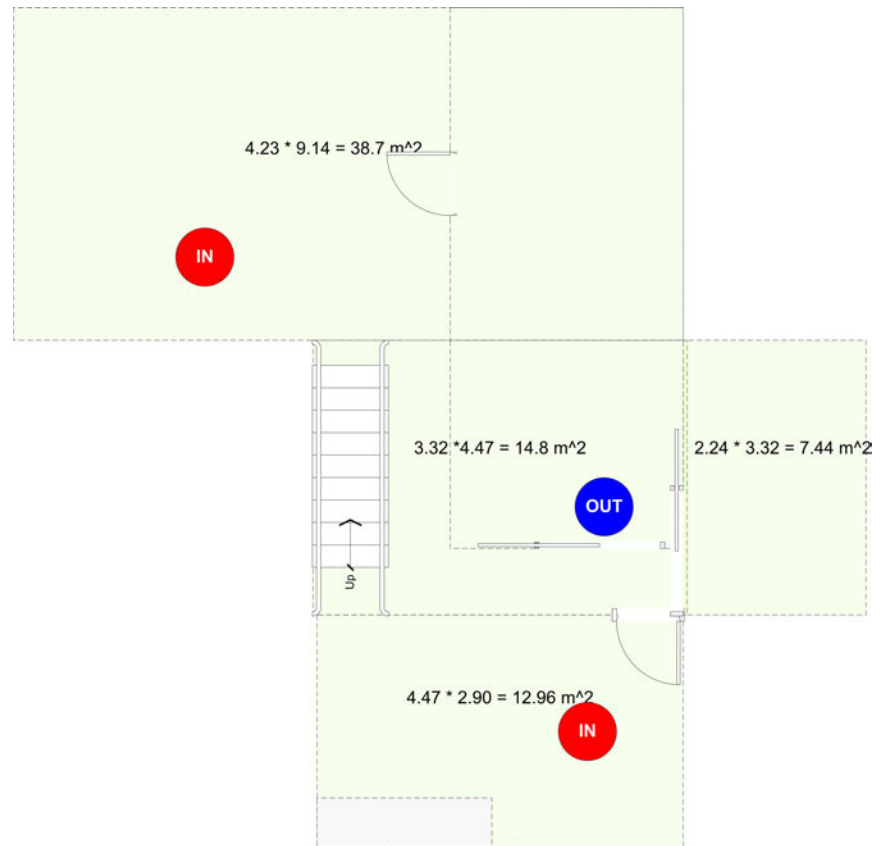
1st level floor plan, HRV air intake and exhaust locations
